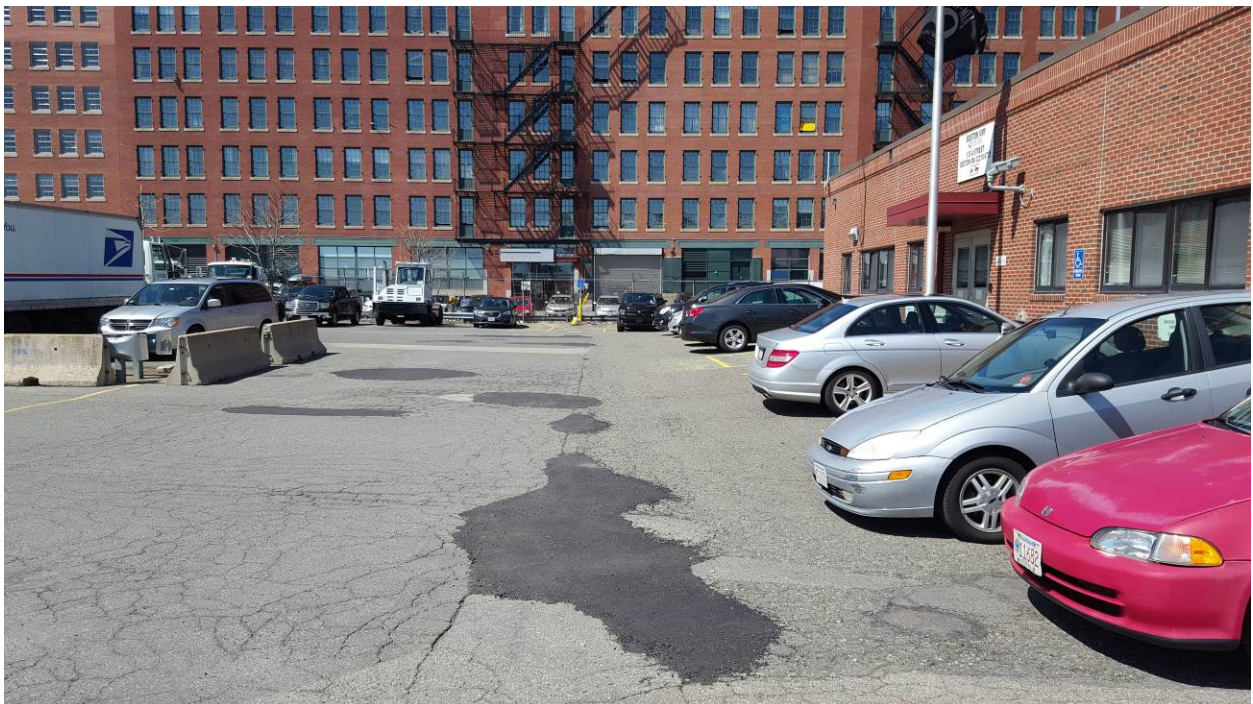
Pavement conditions at front (southeasterly) entrance to VMF Building looking northwest (GRA Photo)
